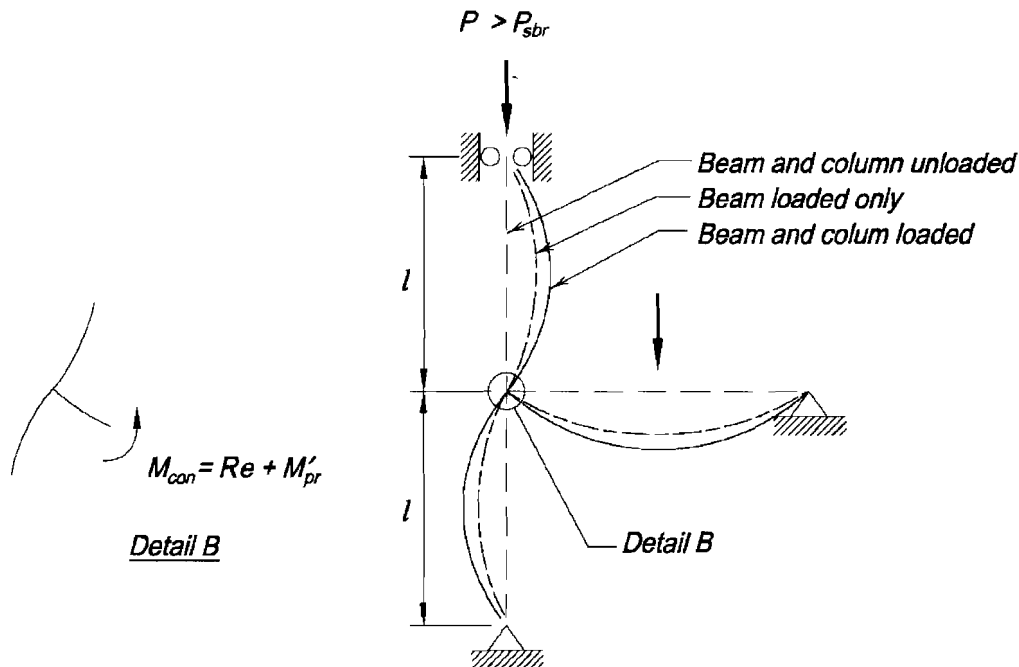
Illustration of beam, column, and connection behavior under loading of beam and column.
